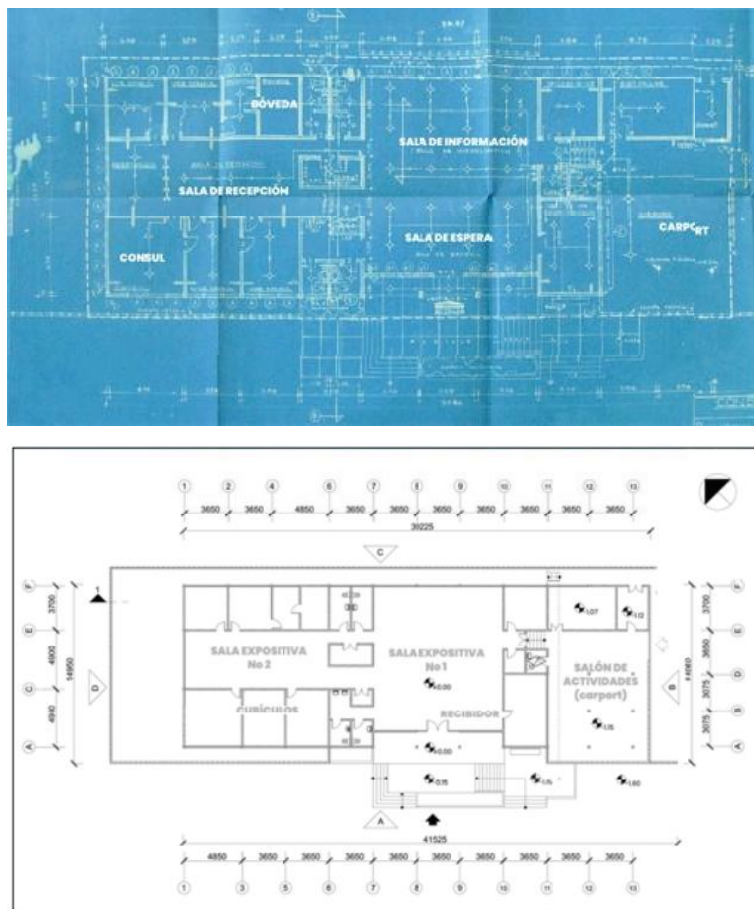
Above: floor plan of the project designed by architects Rogers, Taliaferro, Lamb, and del Mazo. Source: Historical Archive of the Provincial Center for Plastic Arts and Design, 1957. Below: current floor plan. Source: authors,
